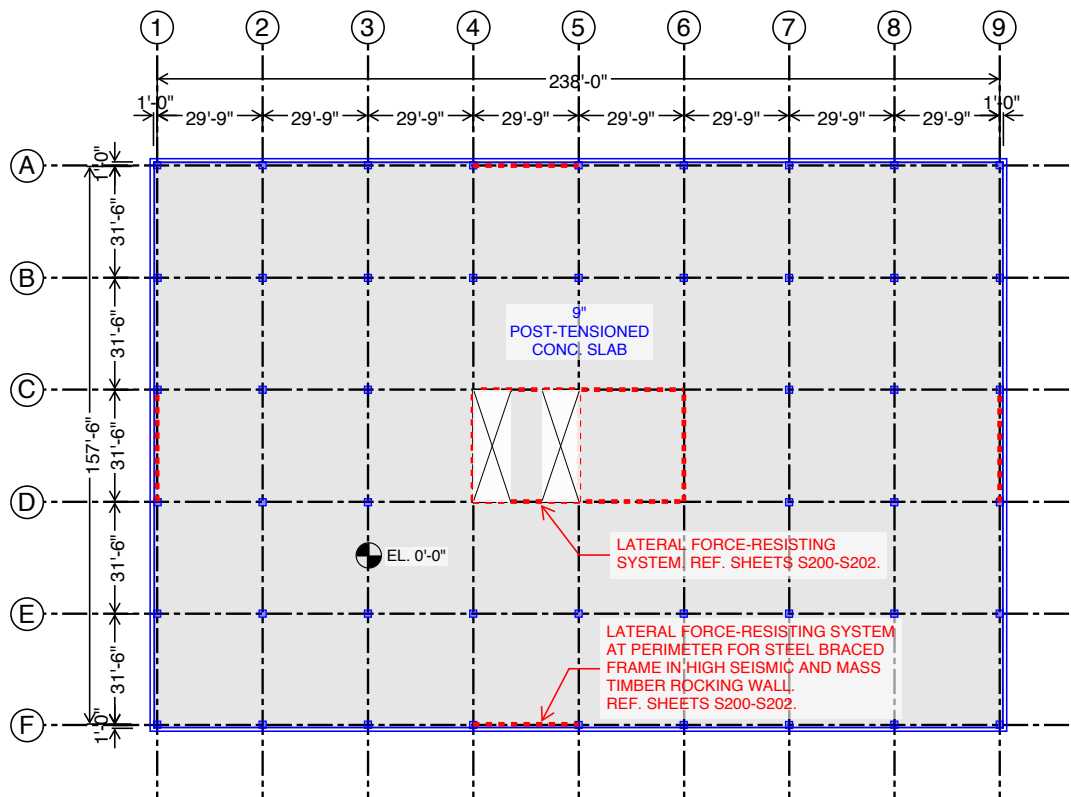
Ground floor plan for the large mass timber office buildings
